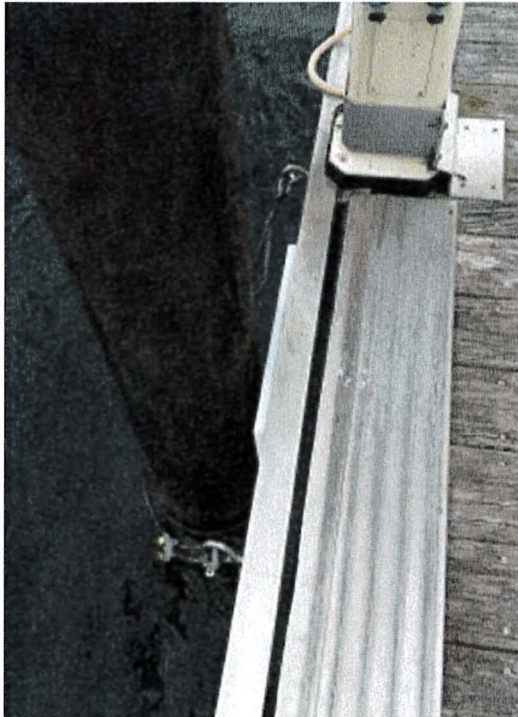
West Main – Dock F. Pile 11. Steel Wire instead of Pile Guide. Welded Capping U Section and Bearing Pad Failed
